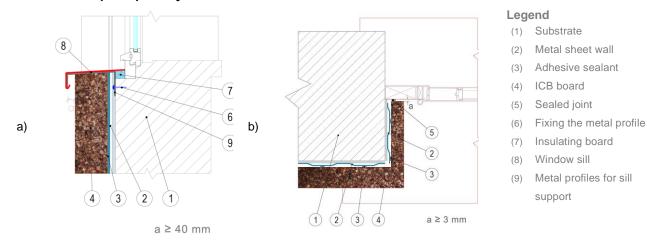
Connection with windows: a) Connection with window sill; b) Connections with side jambs.
